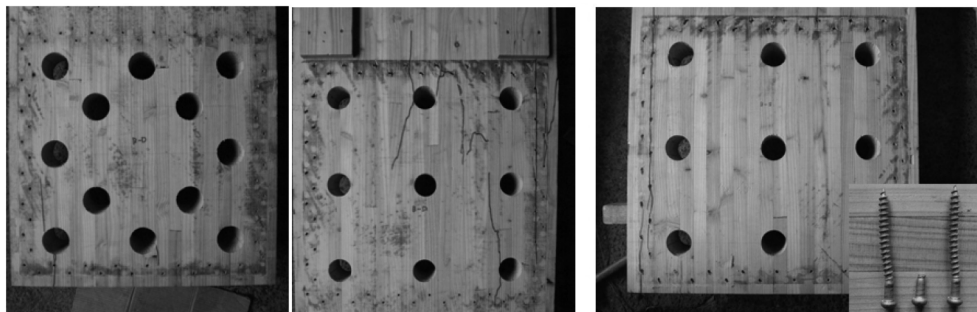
Panel zone and coupling zone of D-member of beam(Left) and coupling zone of S-member of beam(Right)
